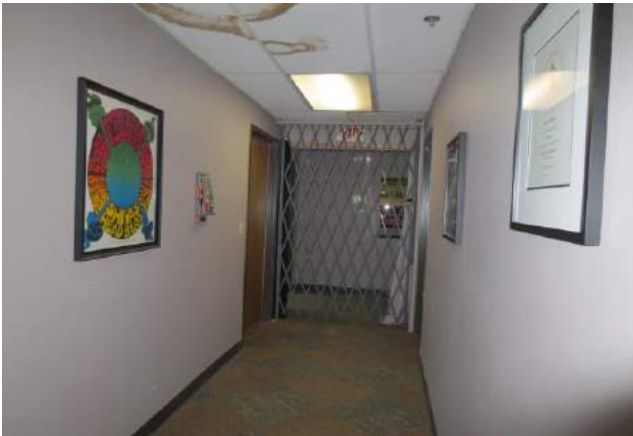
Interior view of the commercial/office building on the site (MSC)
